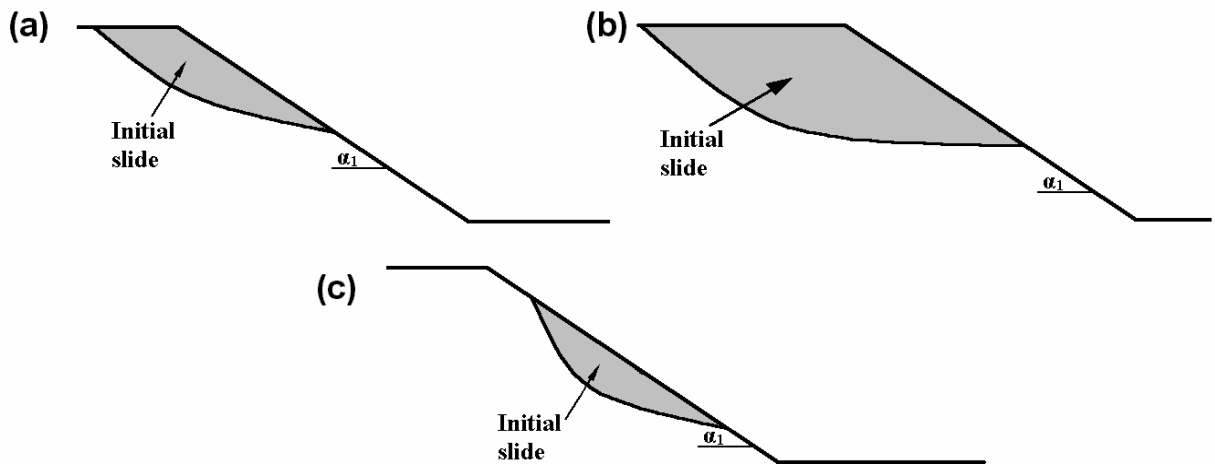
Type 1 failure slope geometries. The initial failure is located above the toe of the slope.
